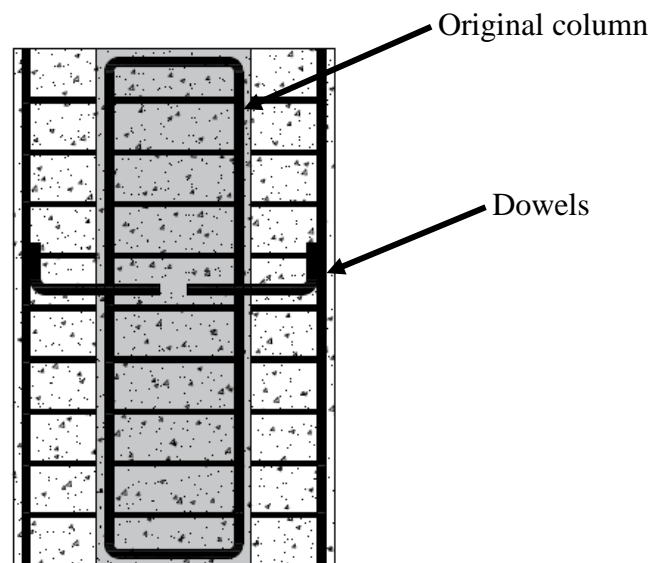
Profile of dowels anchored to original column and reinforced concrete jacket
